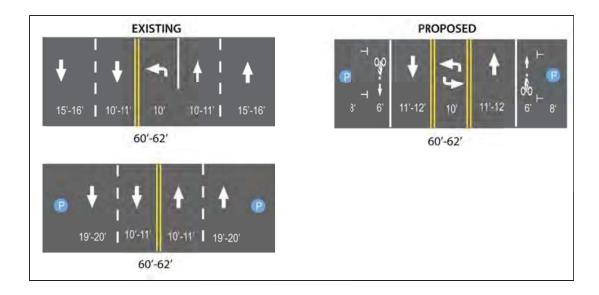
illustrates sample cross-sections of the existing and proposed lane configurations.
